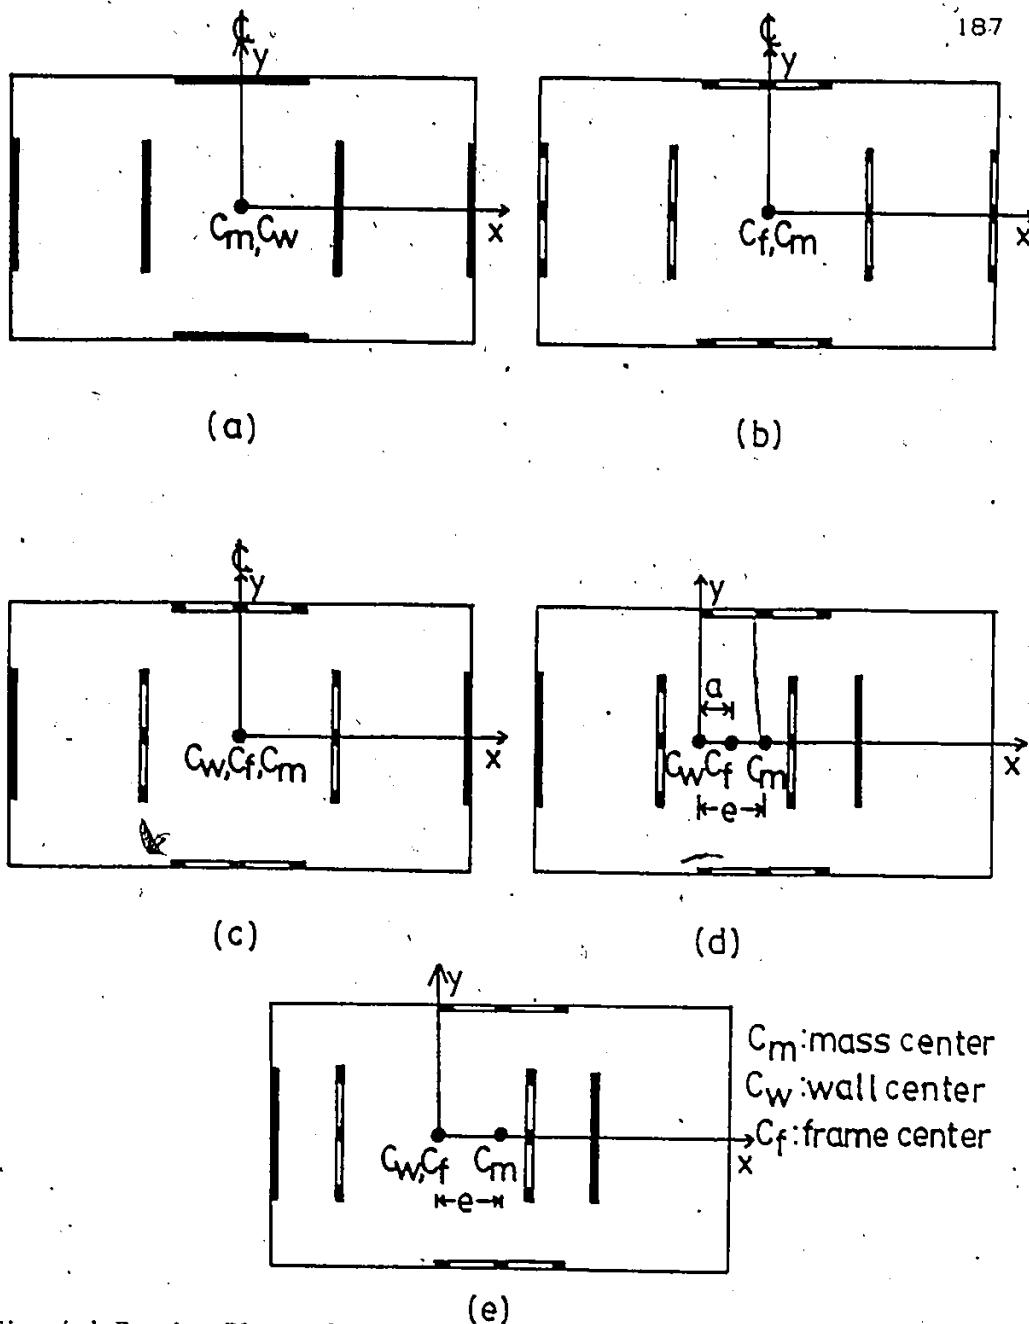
Framing Plans of Wall, Frame and Wall-Frame Buildings
